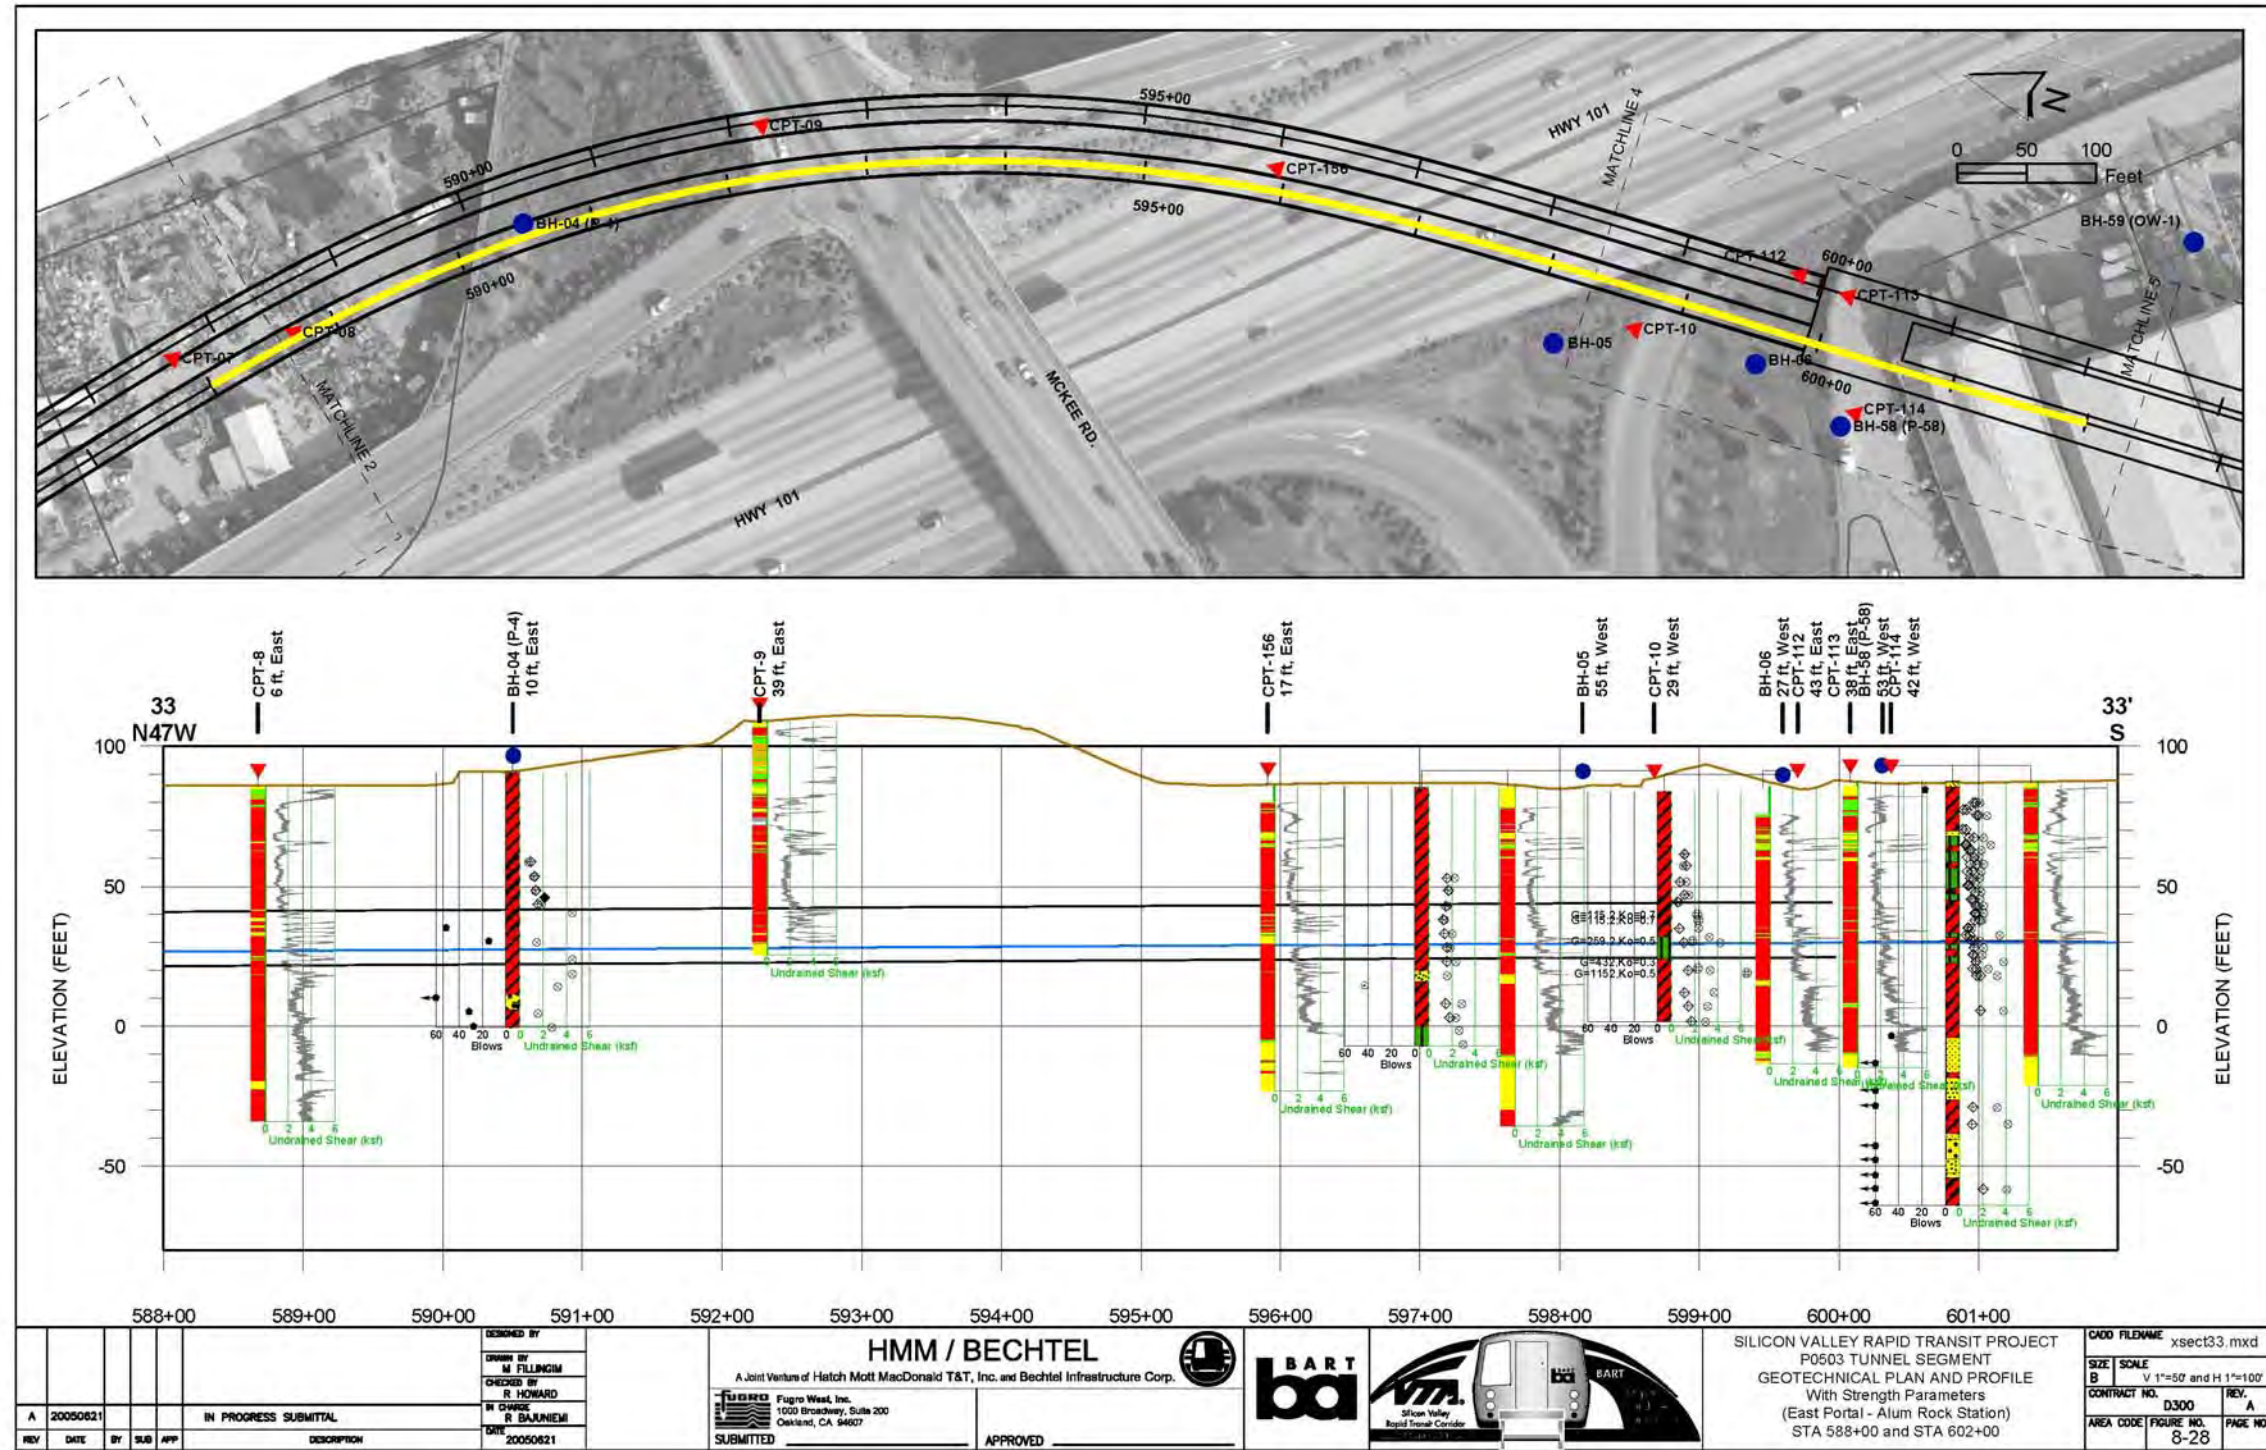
Geotechnical Plan and Profile with Strength Parameters: 588+00 to 602+00.
